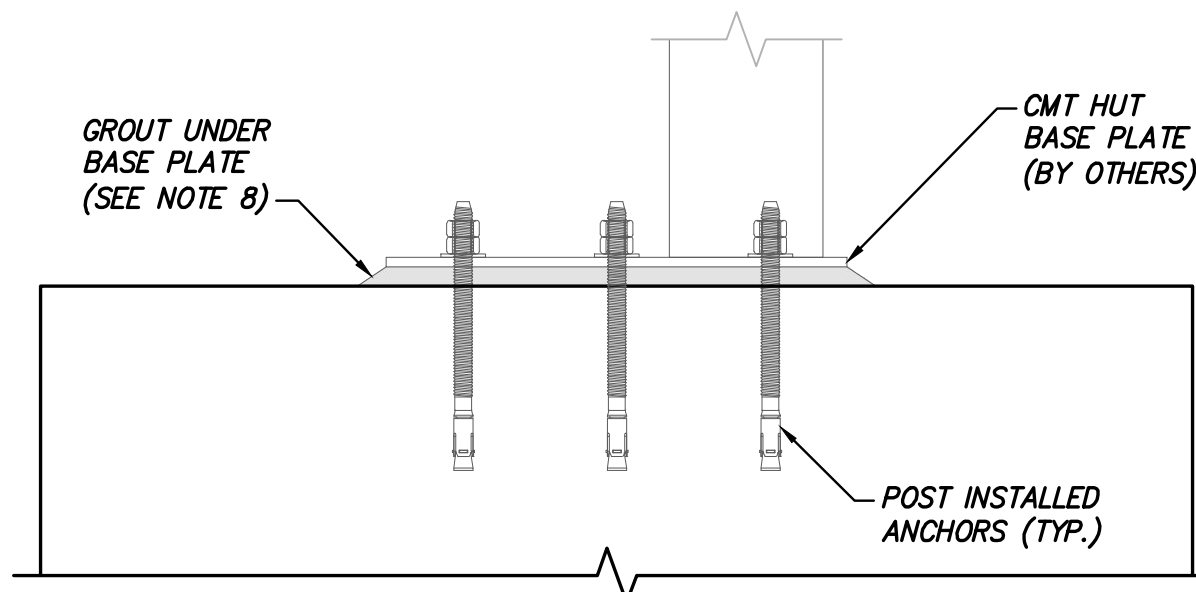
CENTER POST ANCHOR LAYOUT
